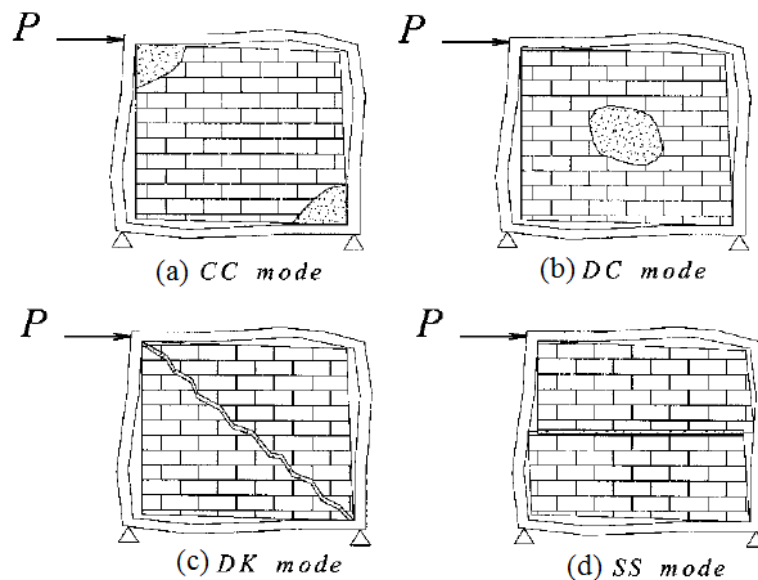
Failure modes of masonry infills: (a) corner crushing mode; (b) diagonal compression mode; (c) diagonal cracking mode; and (d) sliding shear mode [22].
